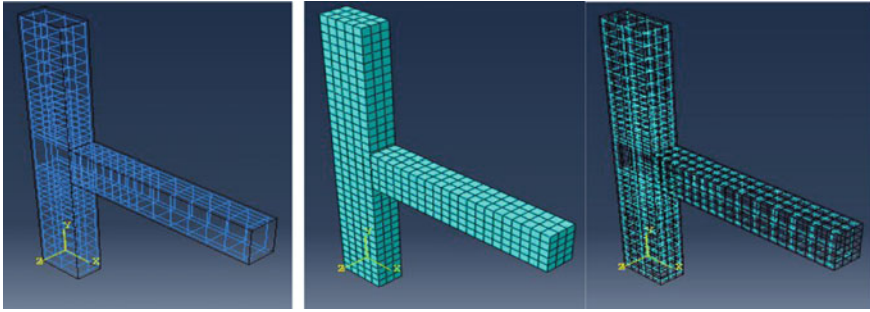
Reinforcement layout and meshing of concrete and steel reinforcement
